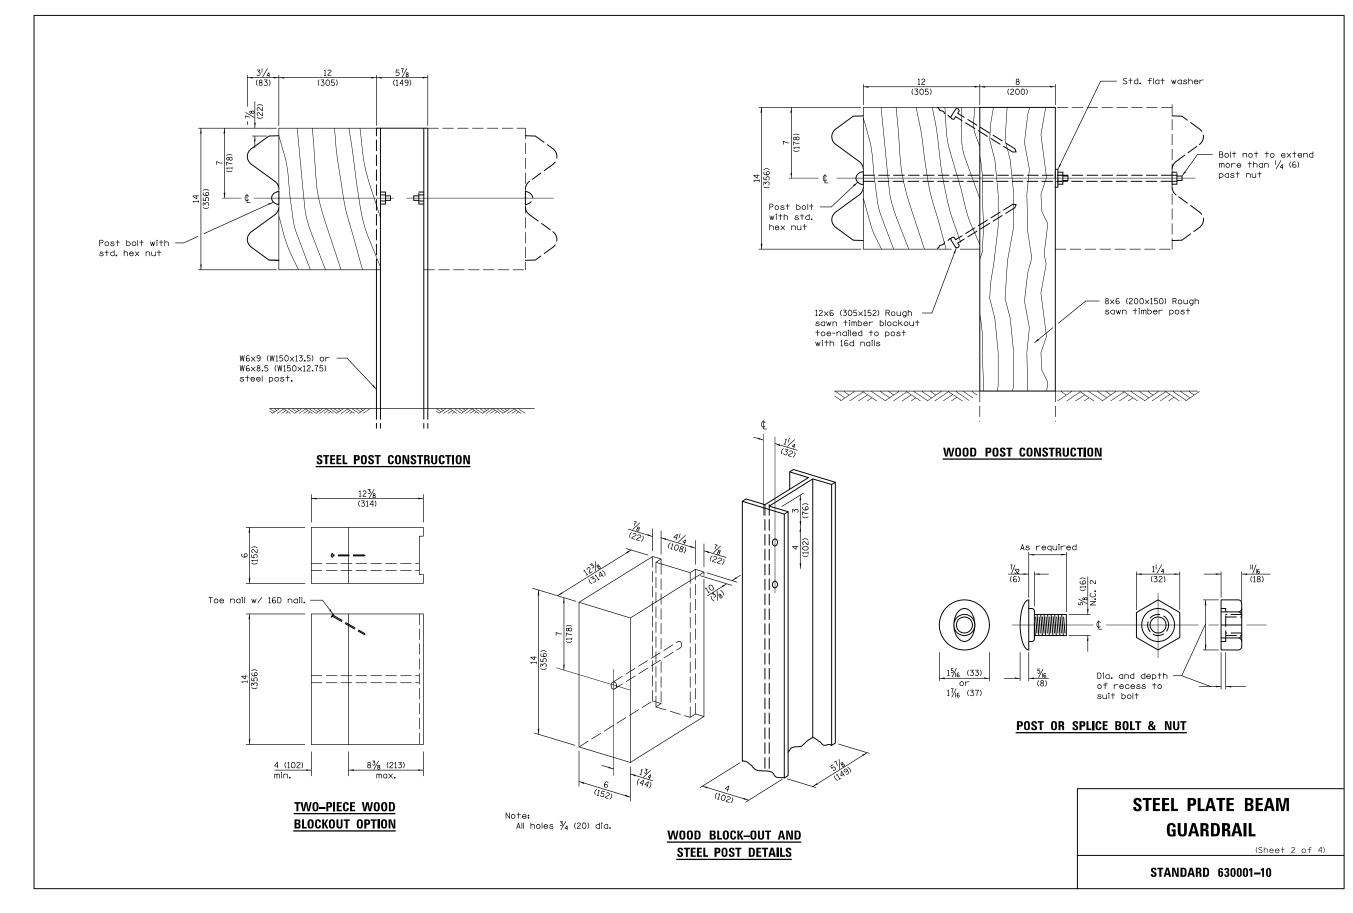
½" STEEL PLATE BEAM GUARDRAIL VAR
